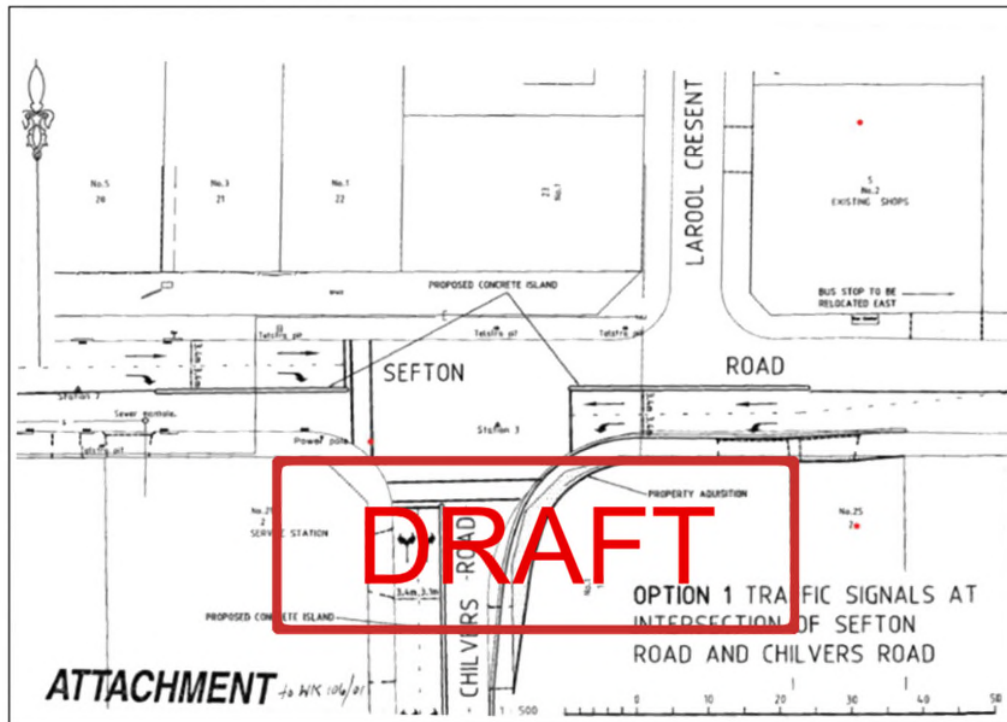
Traffic Signals Layout – Sefton Road / Chilvers Road
